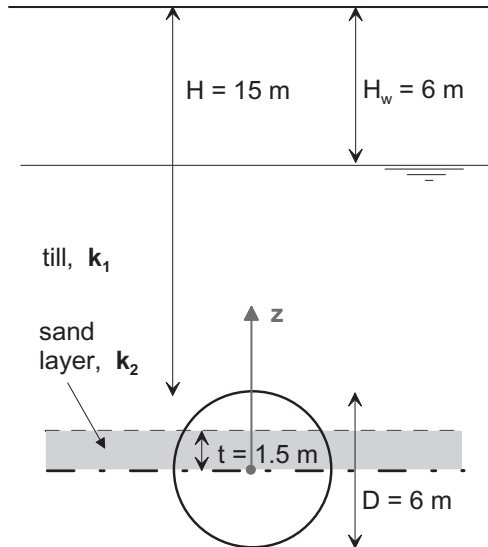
Typical cross-section of tunnel with the sand layer positioned in the first upper half the face.
